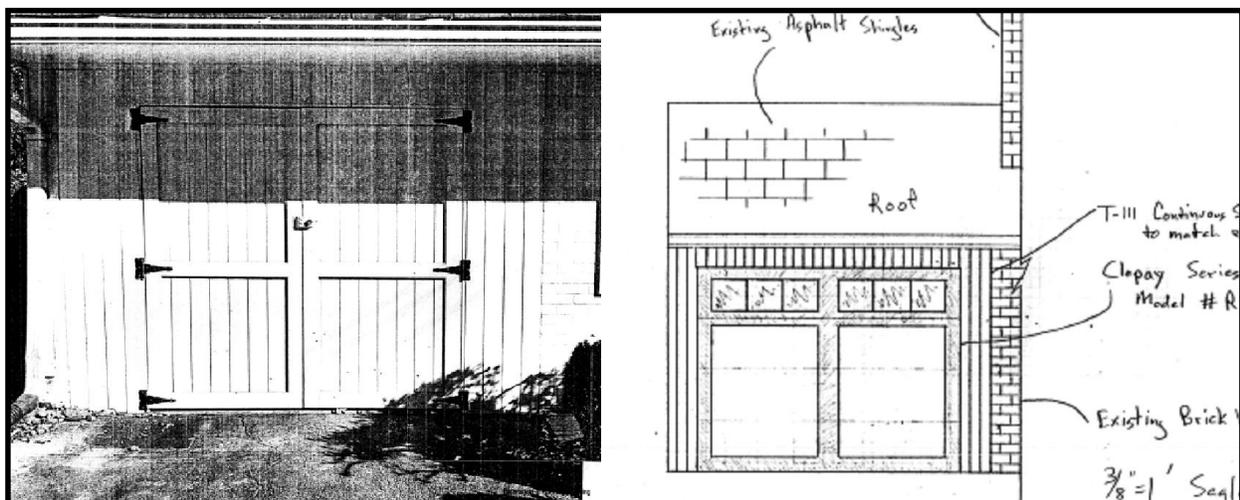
Image of existing garage door and proposed new overhead door design. Source: Applicant.
